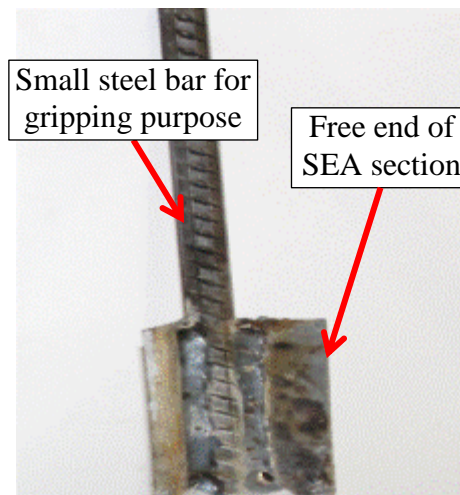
Welding small steel bar at free end of SEA section for gripping purpose
